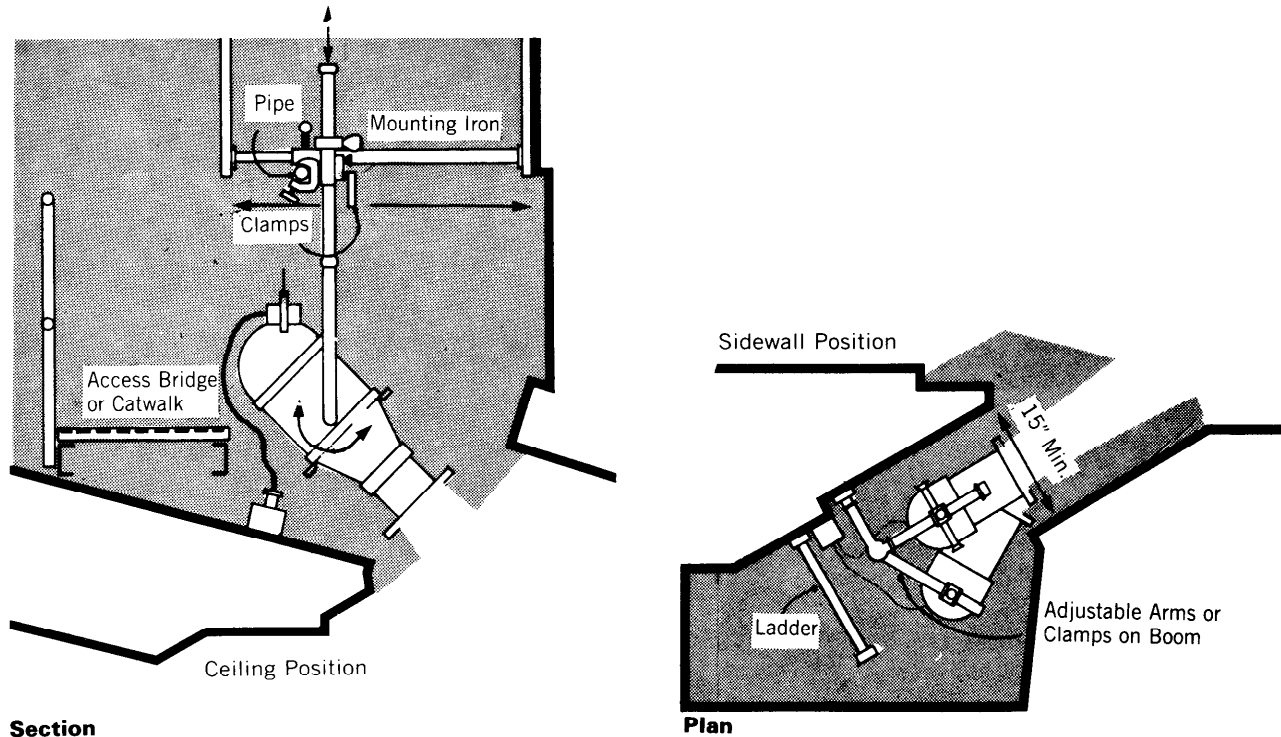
CEILING AND SIDEWALL SLOTS
